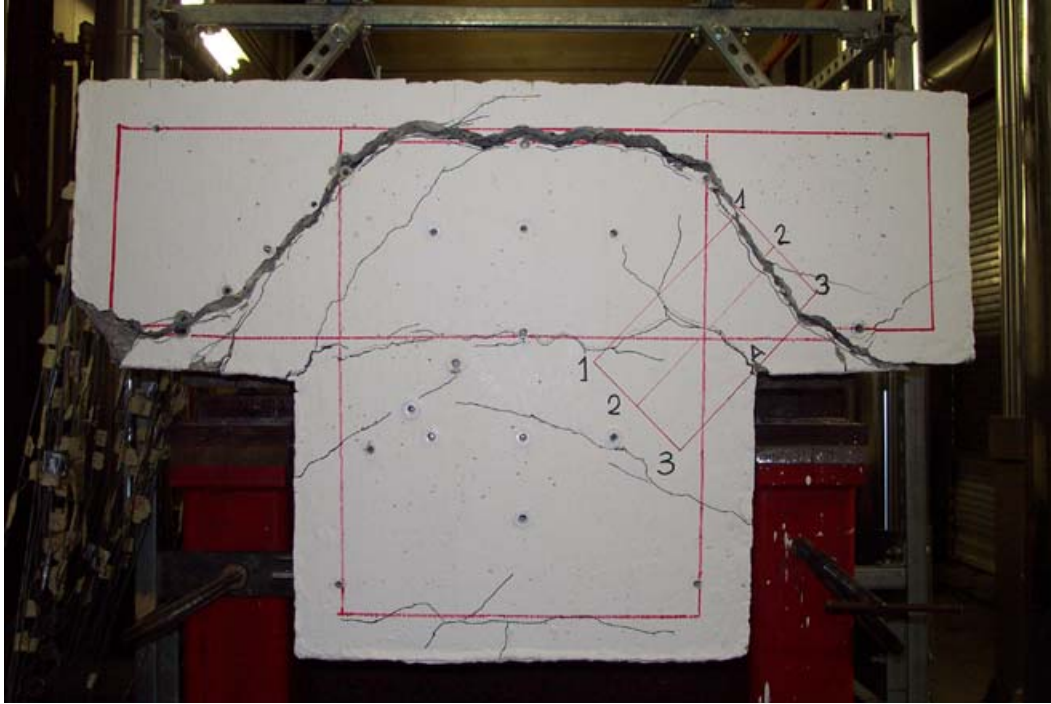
(a) Punching shear failure in Specimen E-0-14
